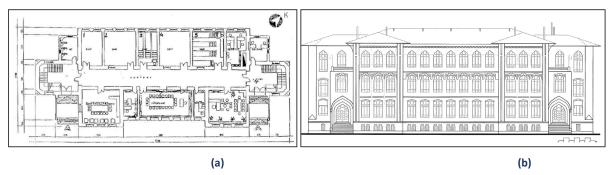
a) Male Teacher High School ground floor plan b) Male Teacher High School entrance facade (Sözen, 1984)
